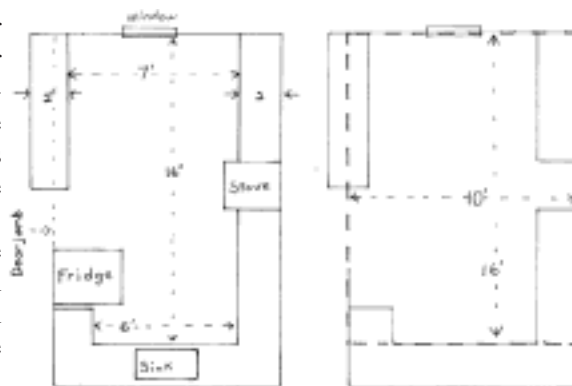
The layout of a typical room and the actual size of sheet flooring required to lay vinyl in it.
